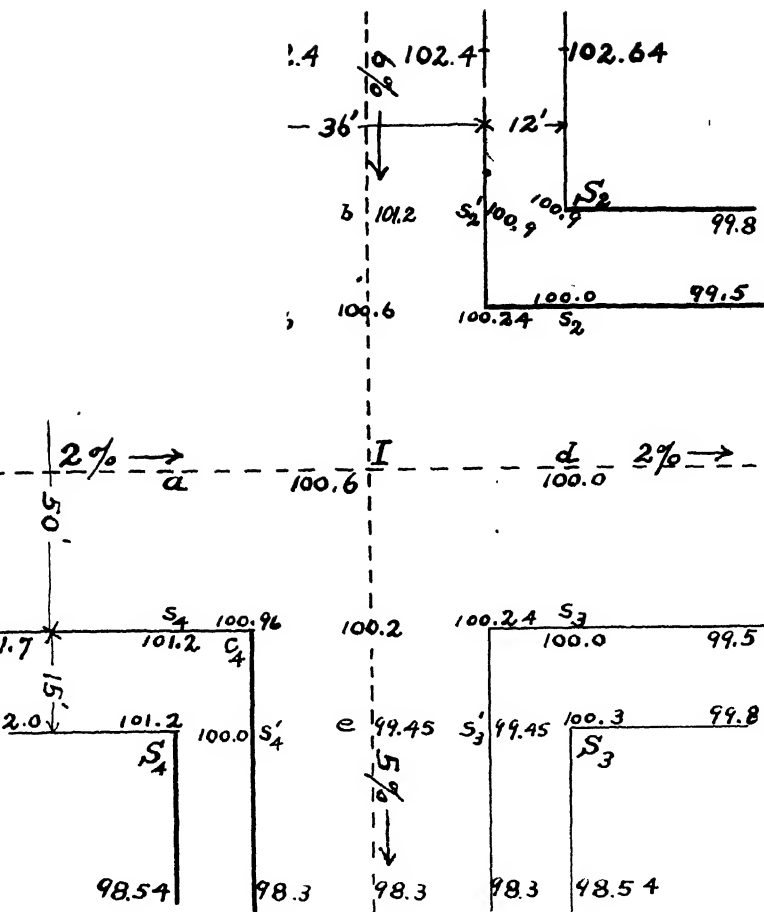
CALCULATING STREET INTERSECTION GRADES
